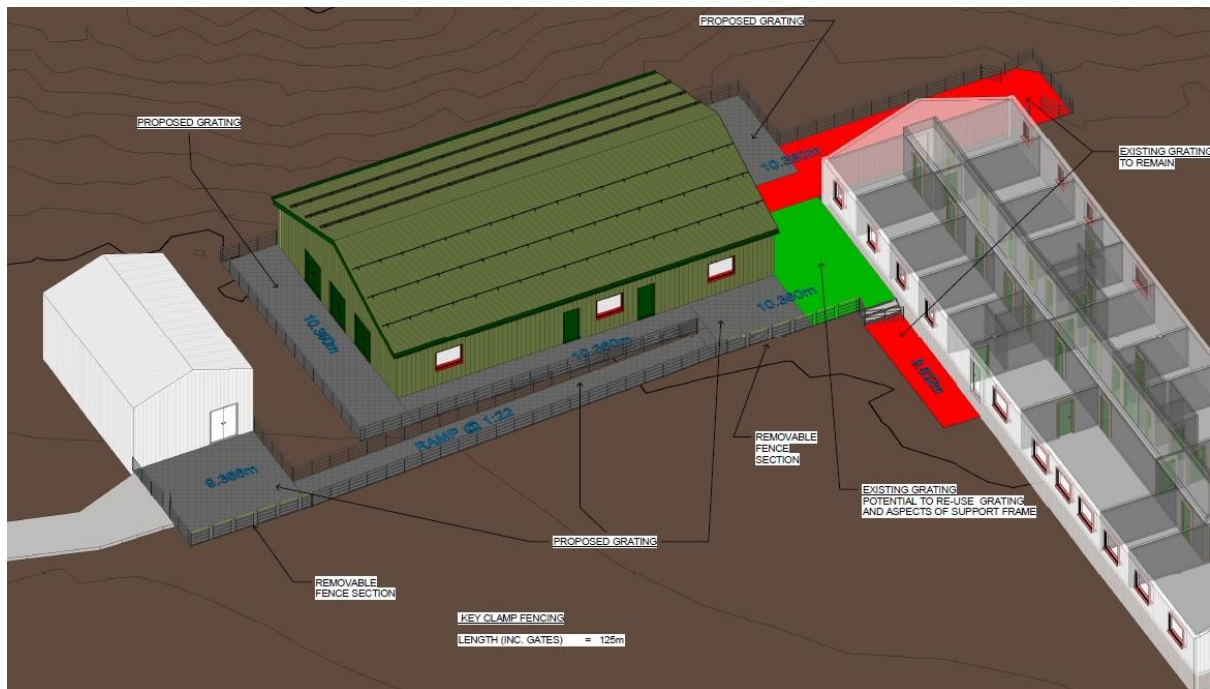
The proposed new Beck House (green building), shown in its position between Prince House and the generator shed, with surrounding walkways.
